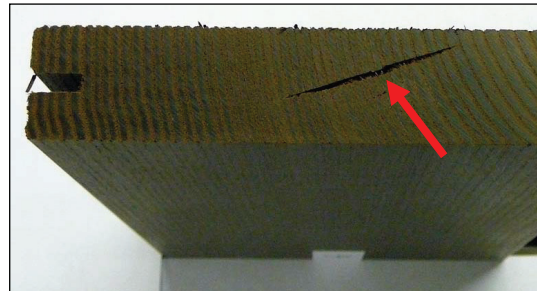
Radial internal cracks, cross section, decking board, ash TMT
